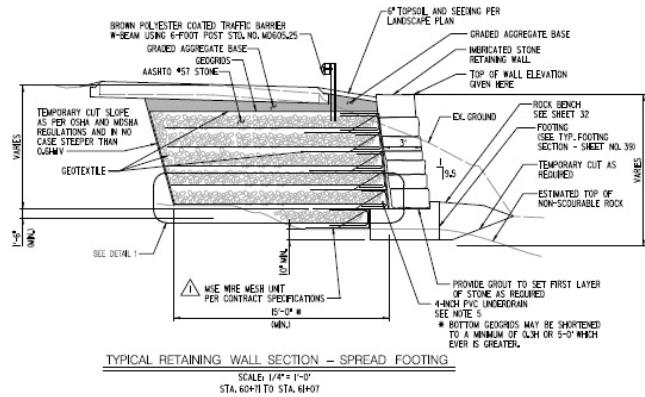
Typical retaining wall section—spread footing (Courtesy of Maryland DOT).
